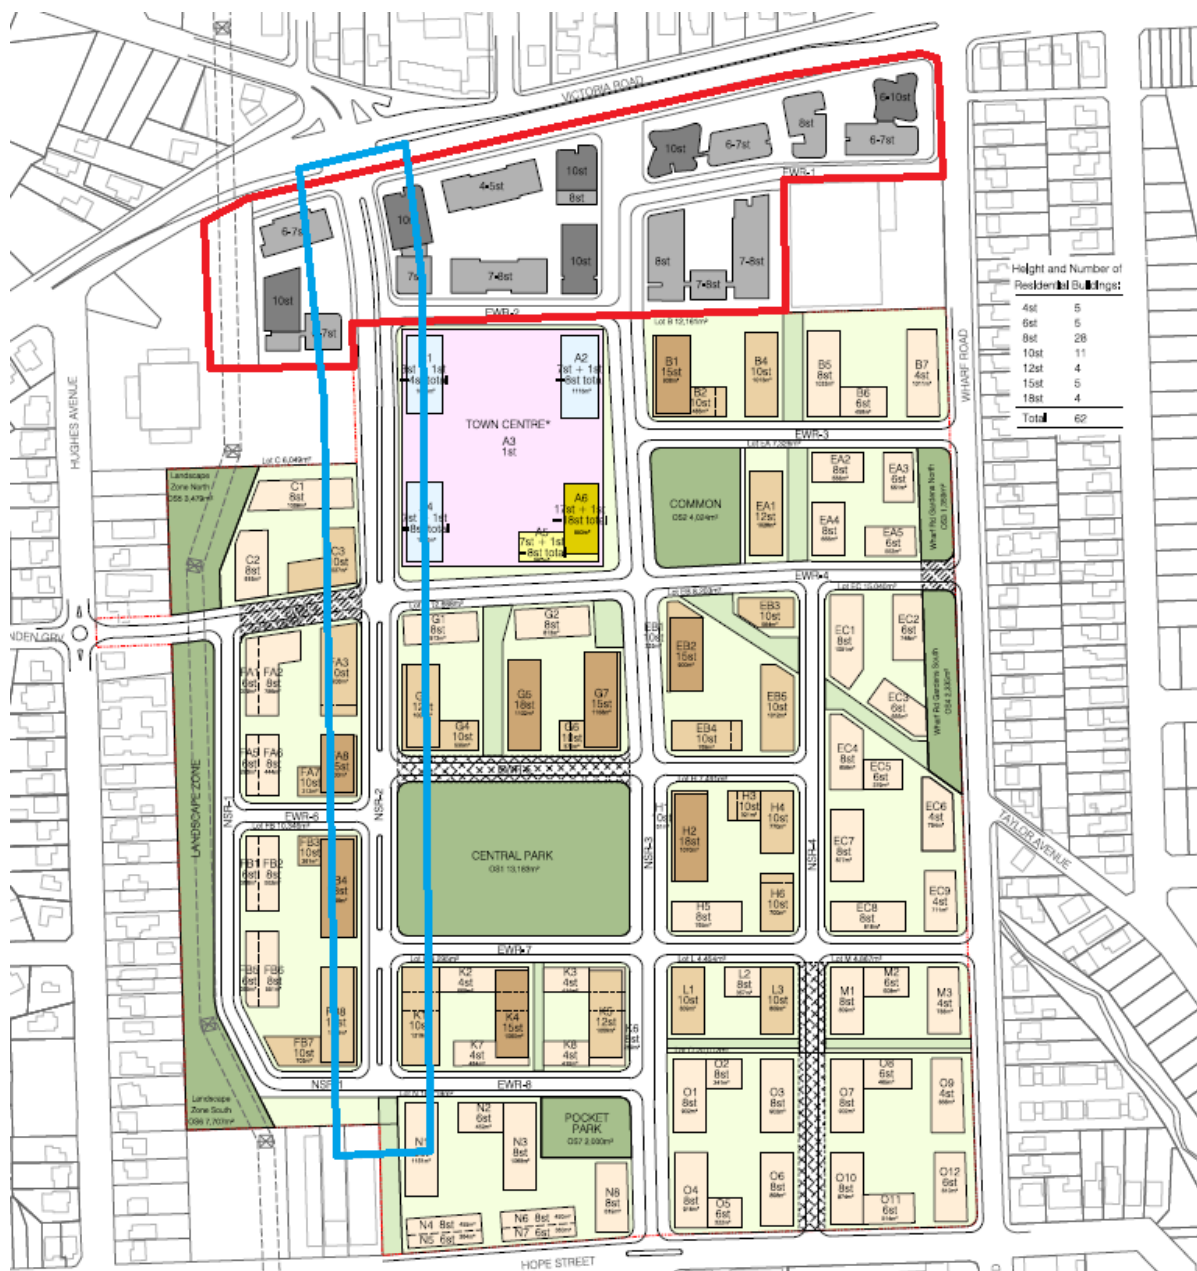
Melrose Park Planning Proposal Masterplan showing subject site in red and NSR-2 corridor in blue. The proposed condition relates to the setback of the buildings shown in grey that adjoin the NSR-2 road reserve.
